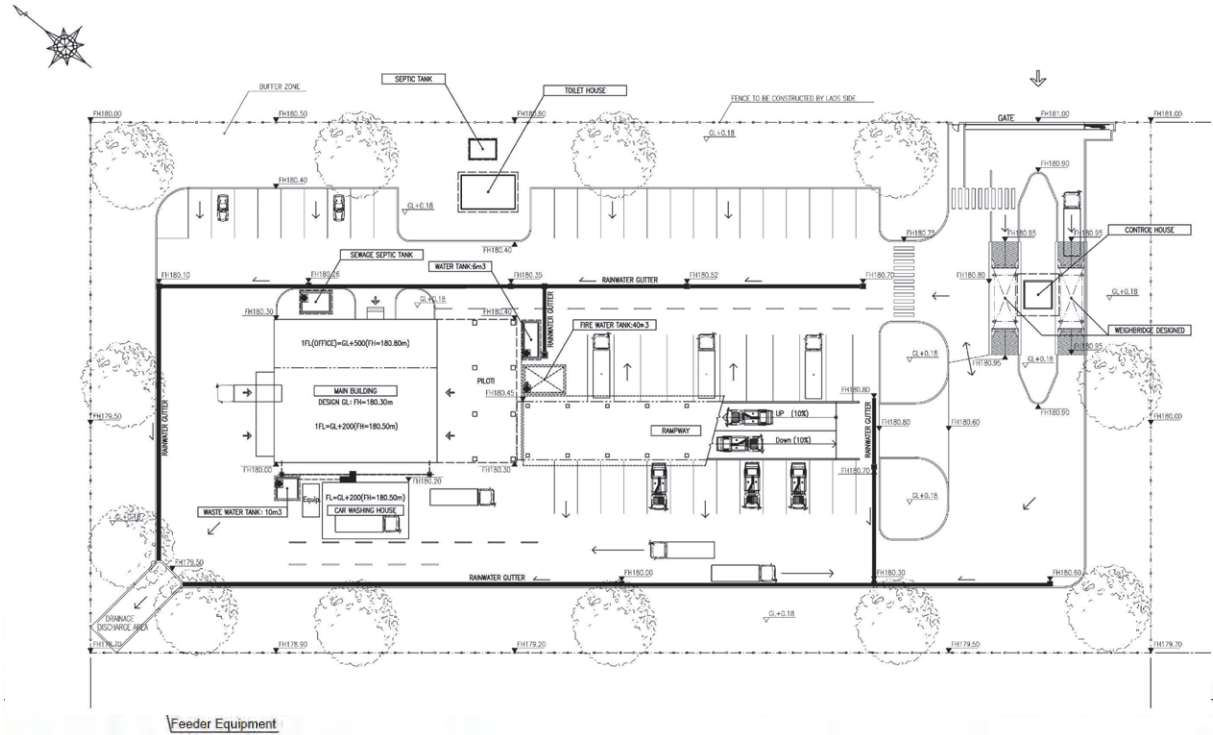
Elevated Plan of the Solid Waste Transfer Station
